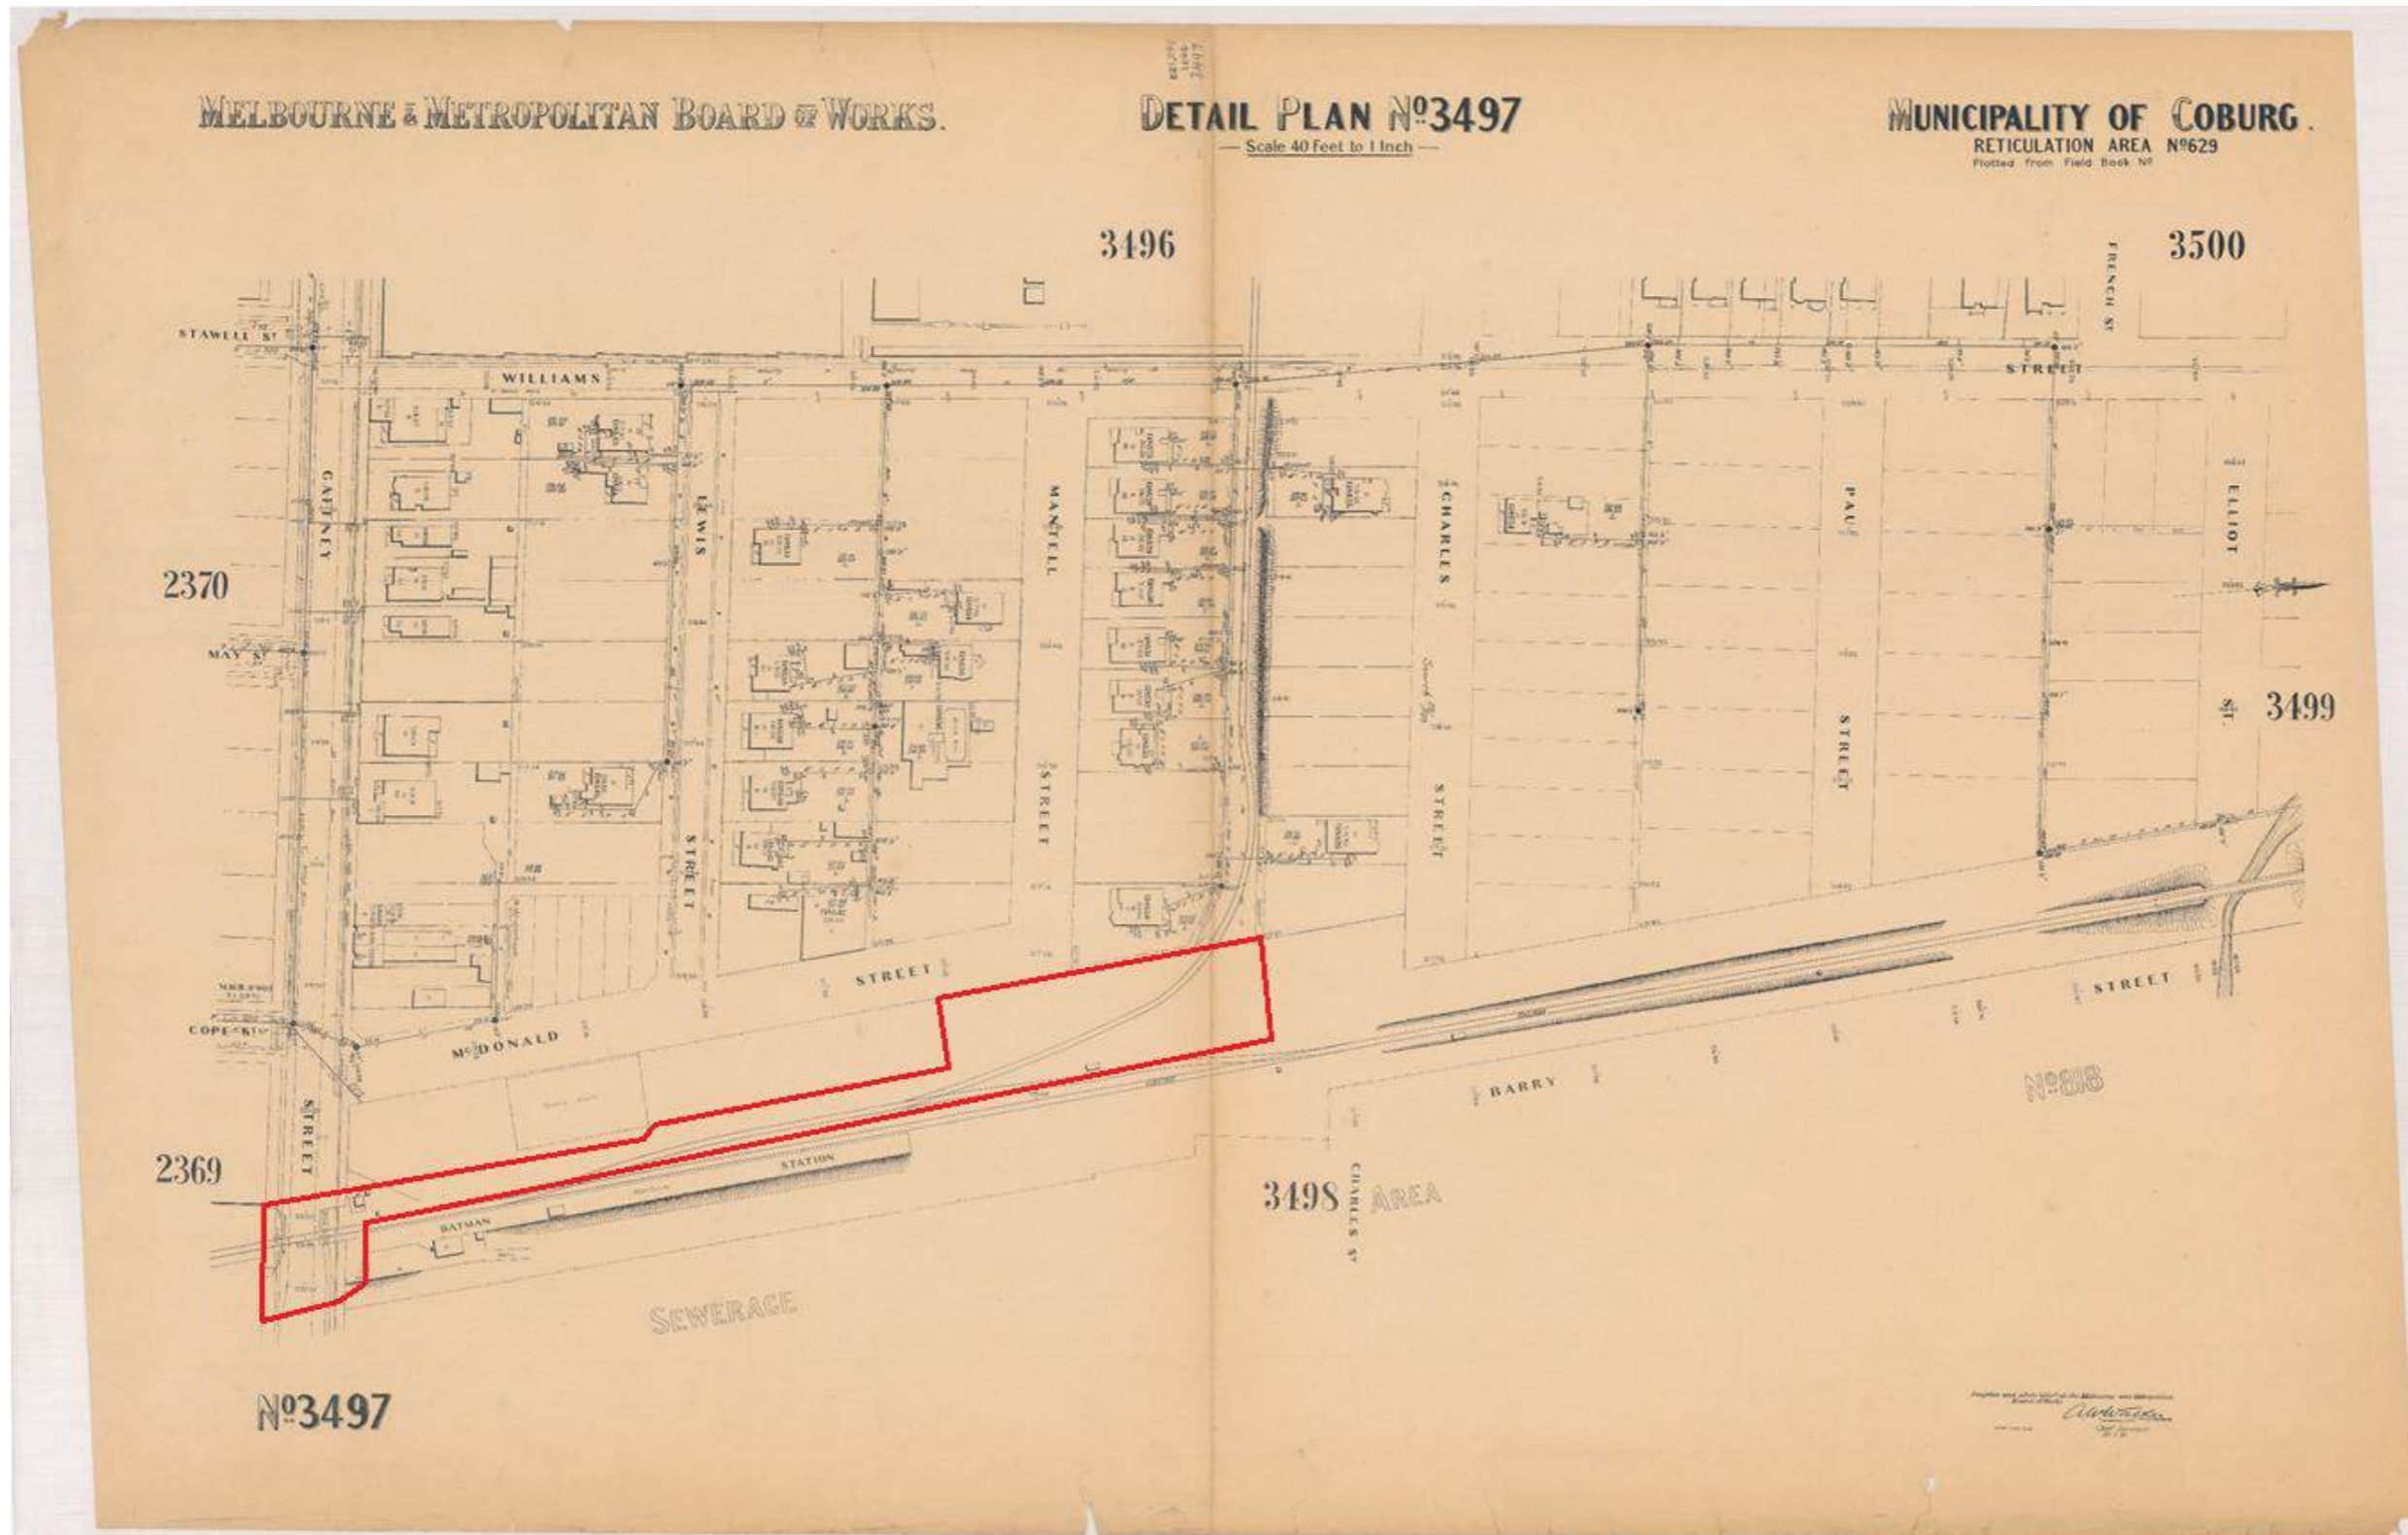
Melbourne Metropolitan board of Works Detail Plan no. 3497, dated to 1895, showing Gaffney Street intersection. Gatekeepers Cabin and rail sidings are visible along with structure to east of Mantell street. North is to right. (State Library of Victoria MMBW Plans, website accessed 10/06/2020)
